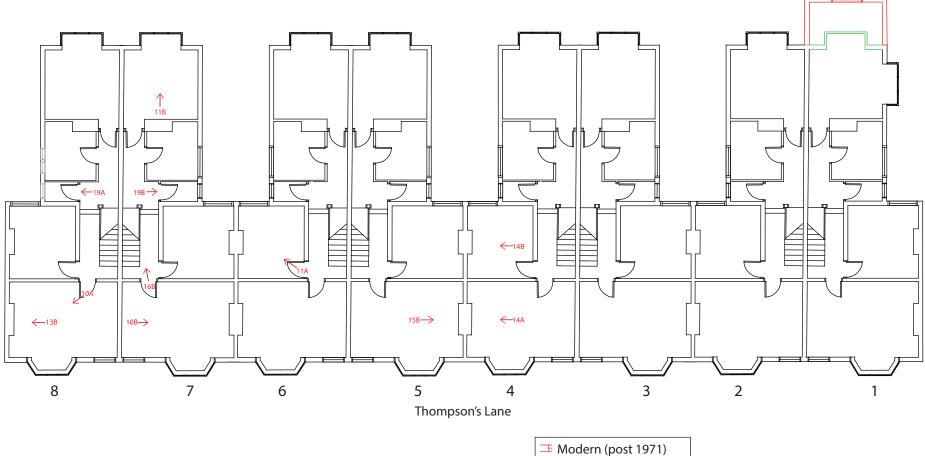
First Floor Plan at 1-8 St Clements Gardens
